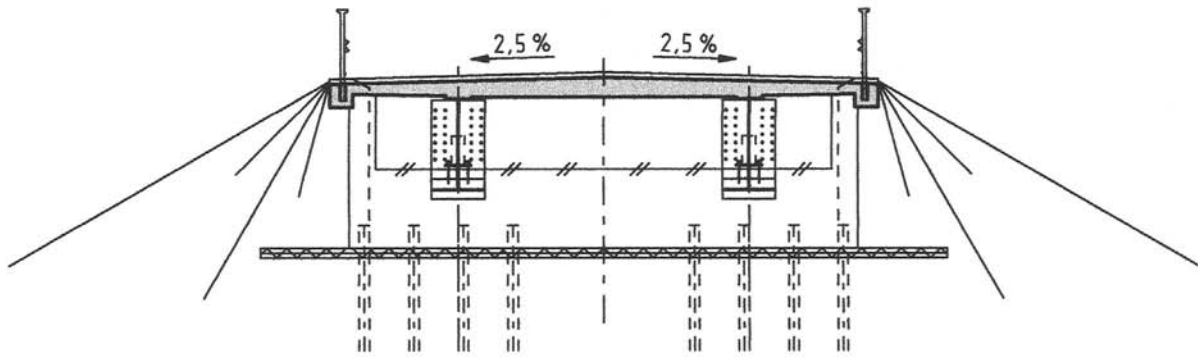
Cross section of a bridge with integral abutments. Eight X-shaped steel piles 180x24 mm carry the vertical load.
